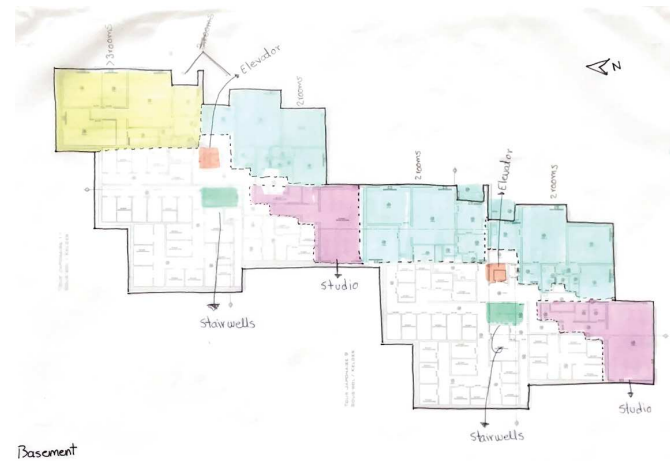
By author. (2025). Apartment typologies basement. [Architectural plan].
